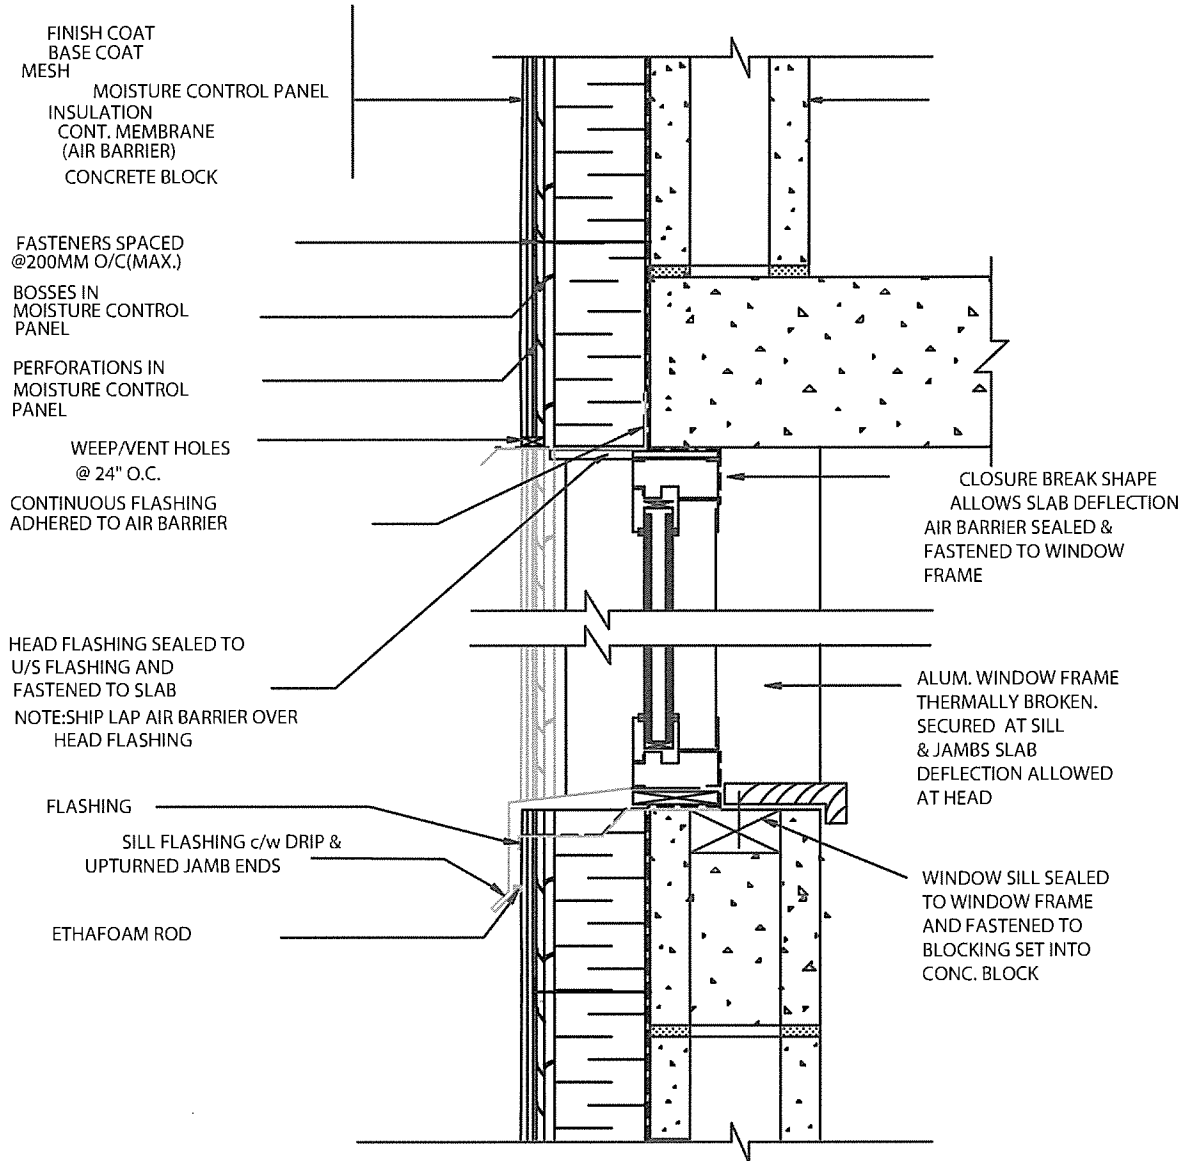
ACRYLIC STUCCO/CONCRETE BLOCK DETAIL
